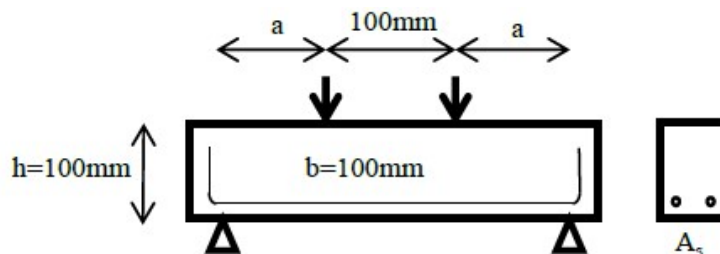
Test configuration for four-point bending and reinforcement details for beams with flexural reinforcement (Georgiou & Pantazopoulou 2017)
